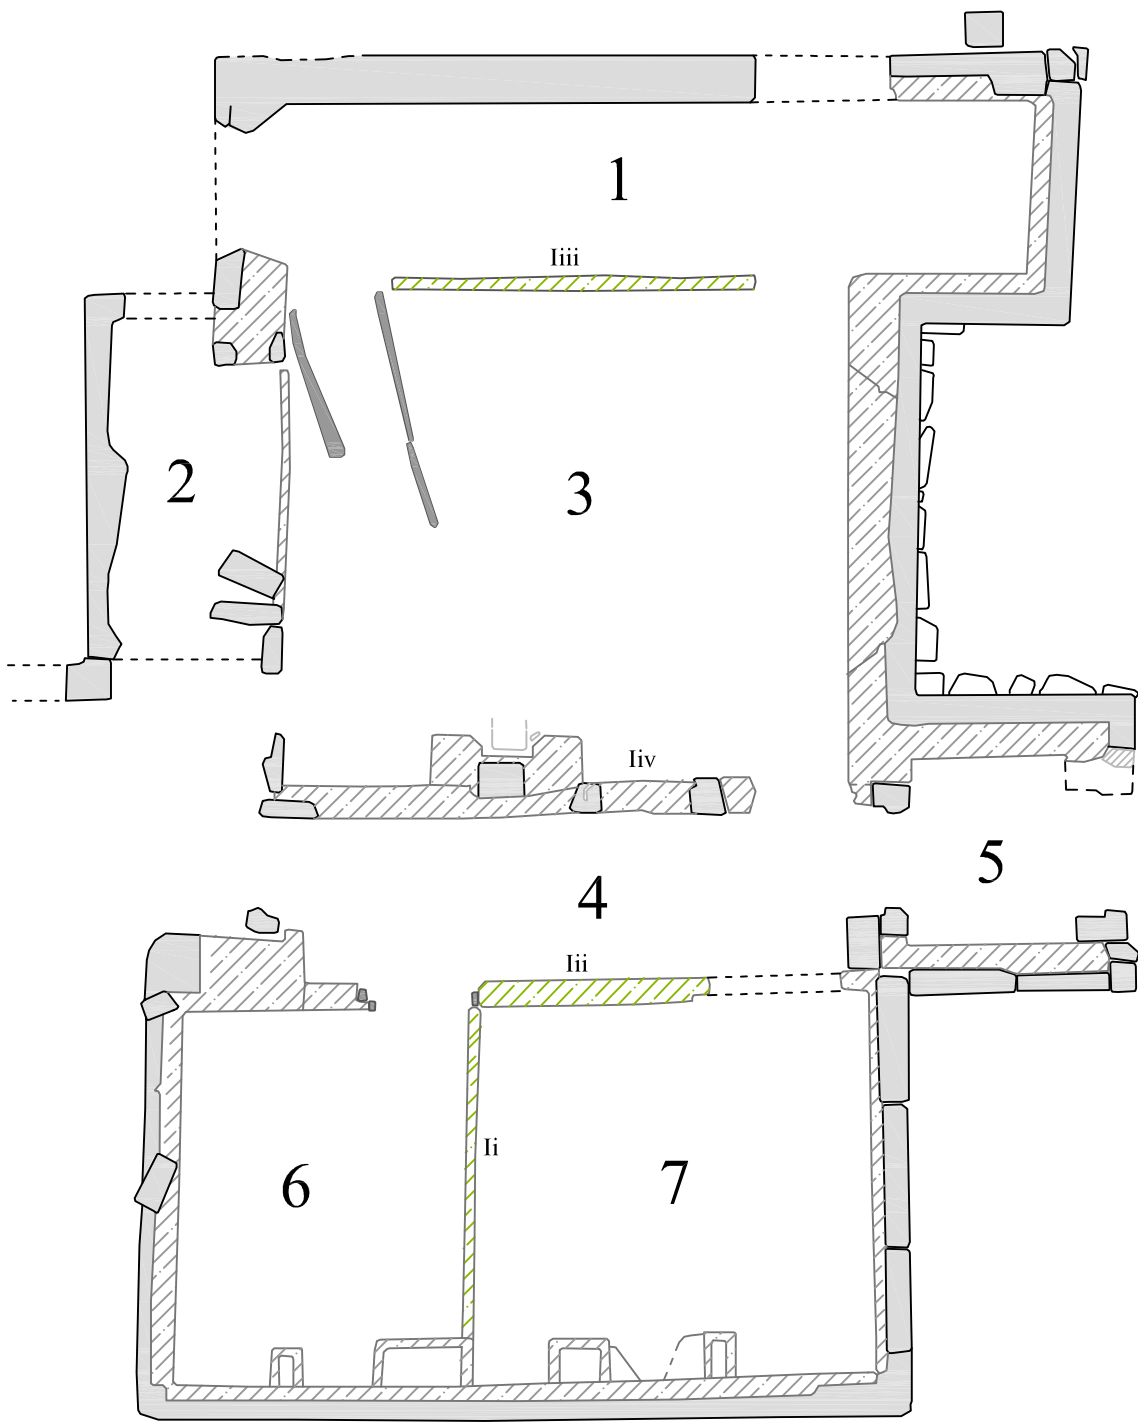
Plan of Clayton Hall c1910 (after Hallam 1983)
